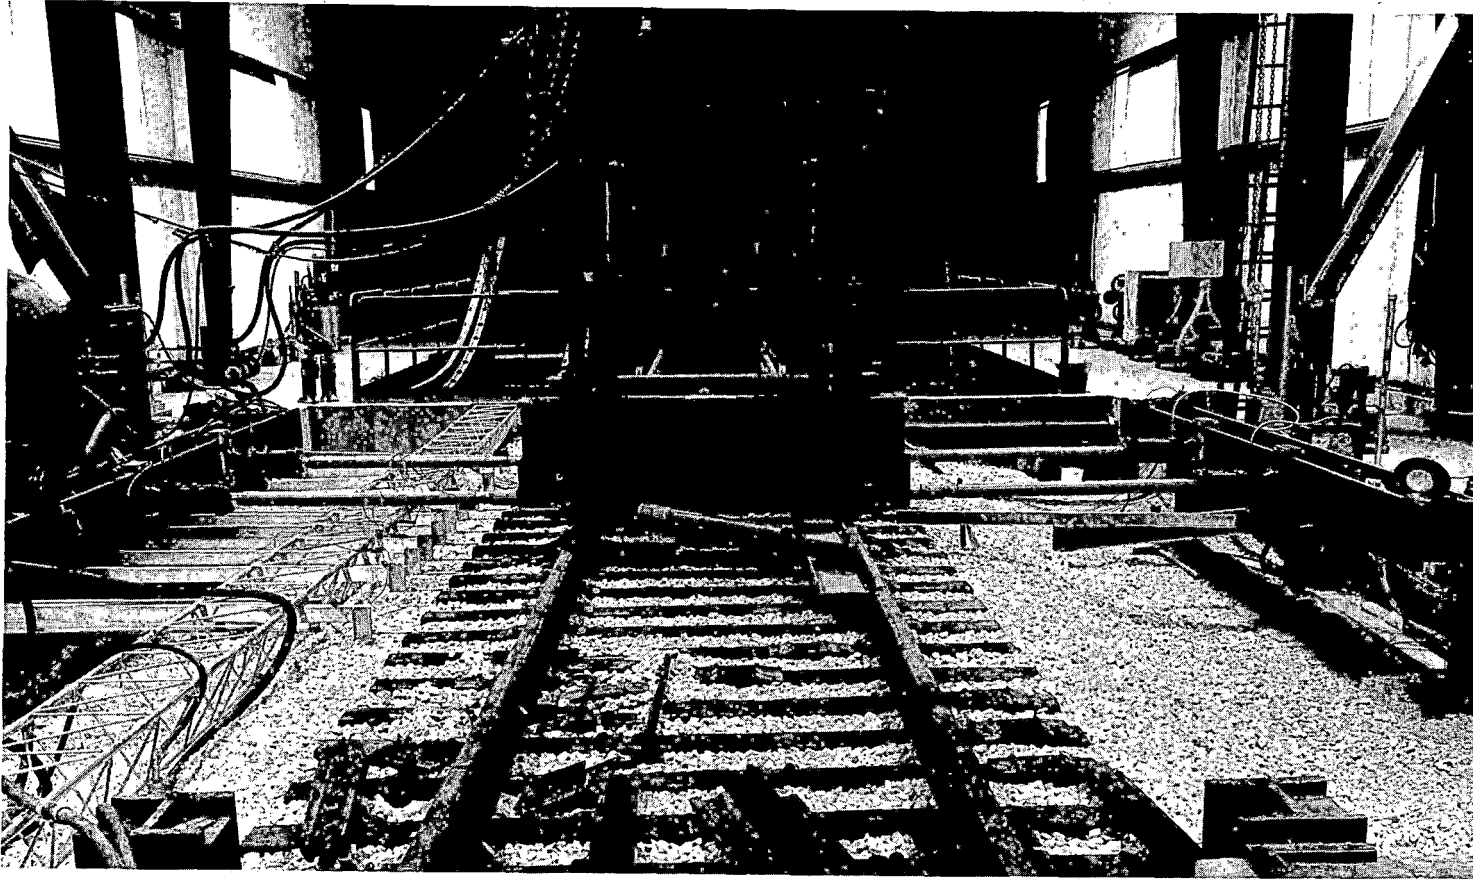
Loading Bolster With Wide Flange Loading Beam Used for Panel Test.
